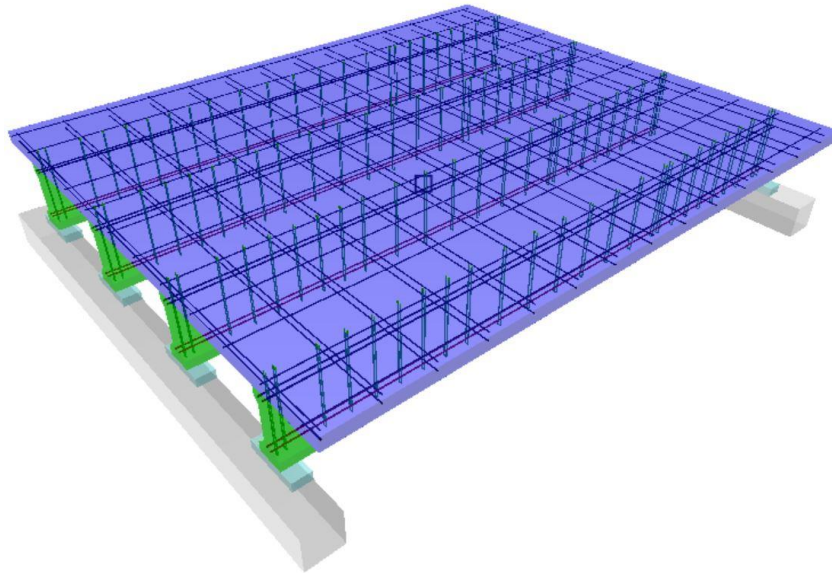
Model of scaled bridge section made using LEAP Bridge Concrete
